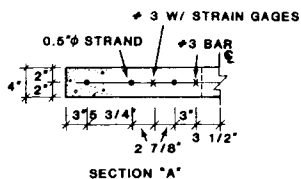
Reinforcing Details of Precast Prestressed Concrete Slab (1 in. = 25.4 mm; 1 ft = 304.8 mm)
